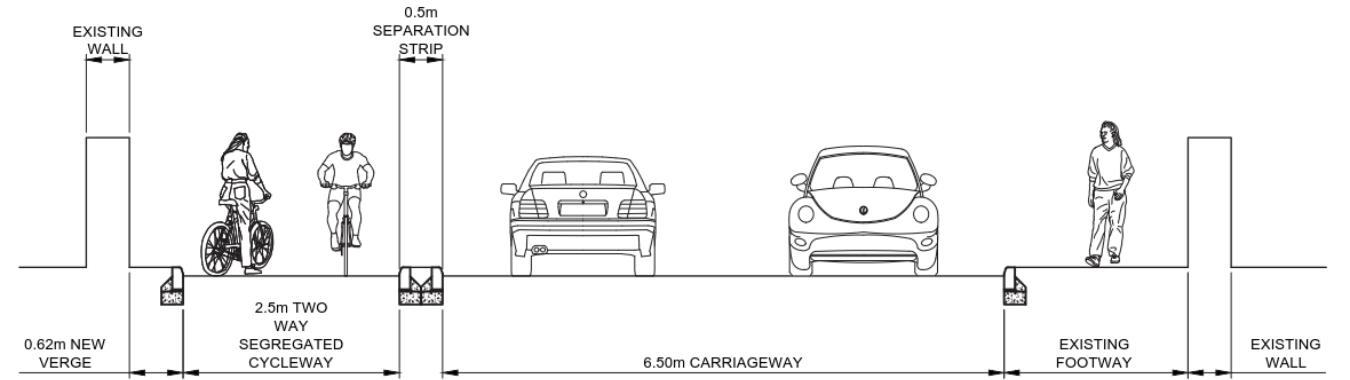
Cross Section Route 2 - Linkfield Road (A199) to Wallyford
